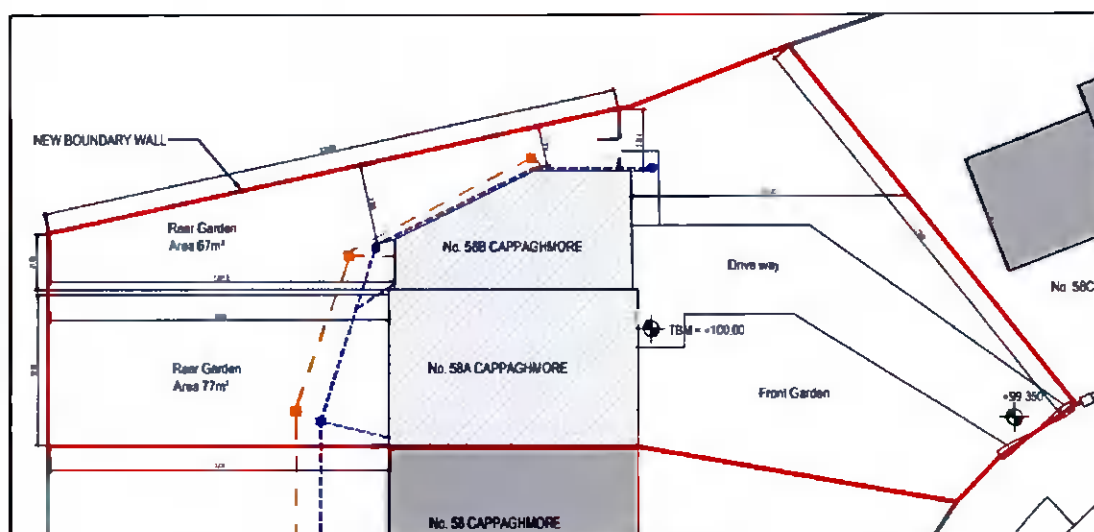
Extract from Proposed Site Block Plan illustrating enlarged rear garden area to No. 58B Cappaghmore
